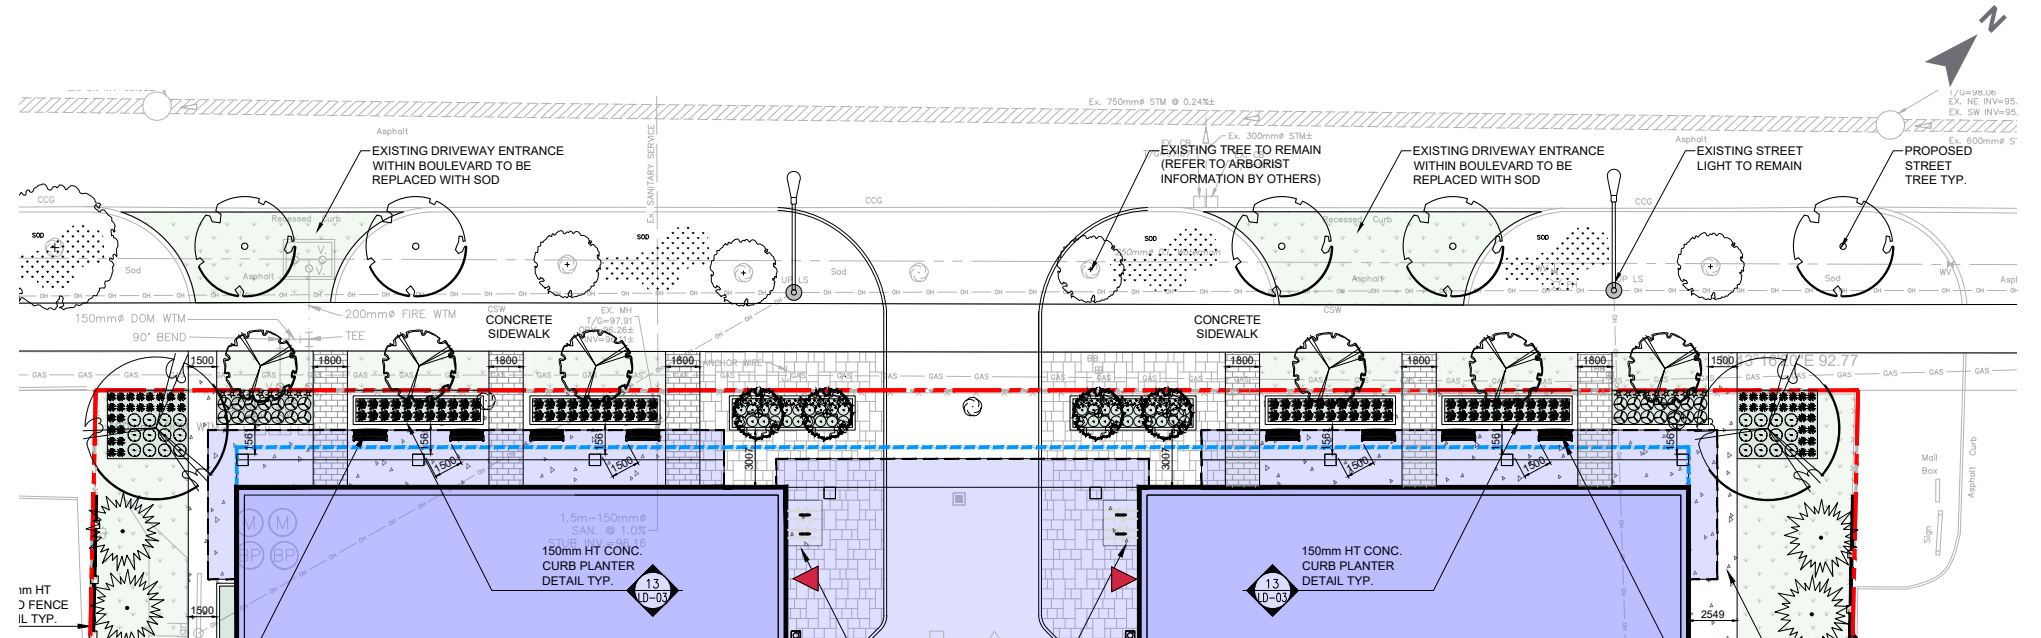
Plan View of Streetscape Design - Prepared by MSLA
